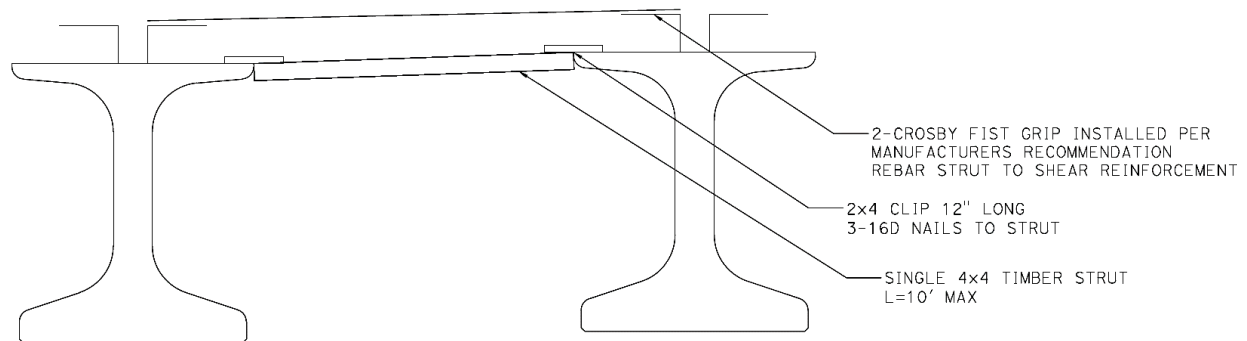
PC PS Concrete Girder Temporary Bracing Detail – Remaining Girders
